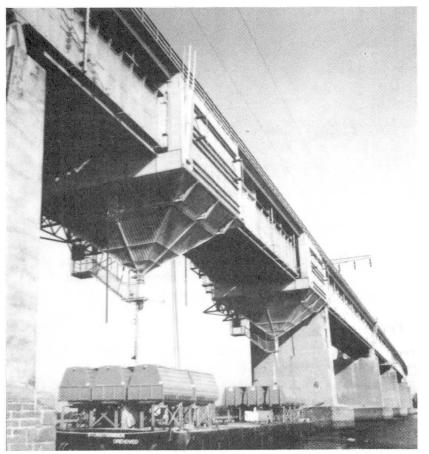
shows the entire system with the two mobile platforms at work on a span of the bridge. The barge with all the new and used sand is placed under the platform and can be accessed directly from the platforms.
